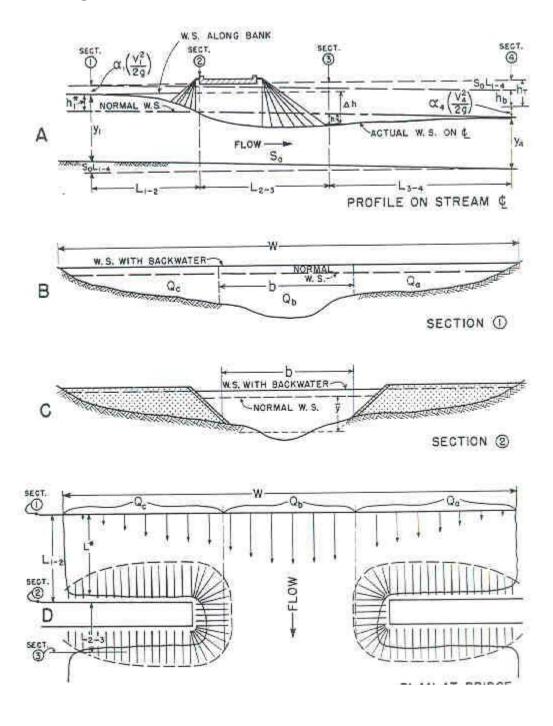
Schematic representation of how bridge backwater is measured <u>at the approach section</u> for a bridge with wingwall abutments
